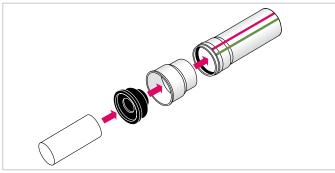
RAUPIANO PLUS connection pipe with rubber nipple.
